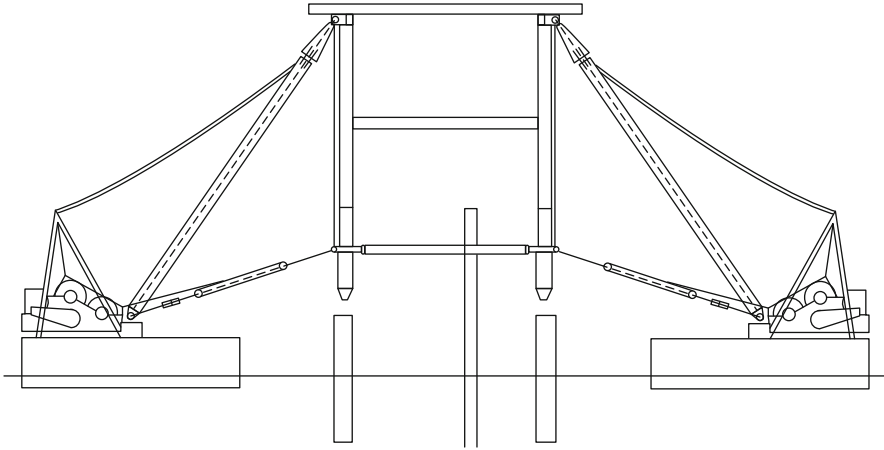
Versatruss method (Source: Versabar Inc)
